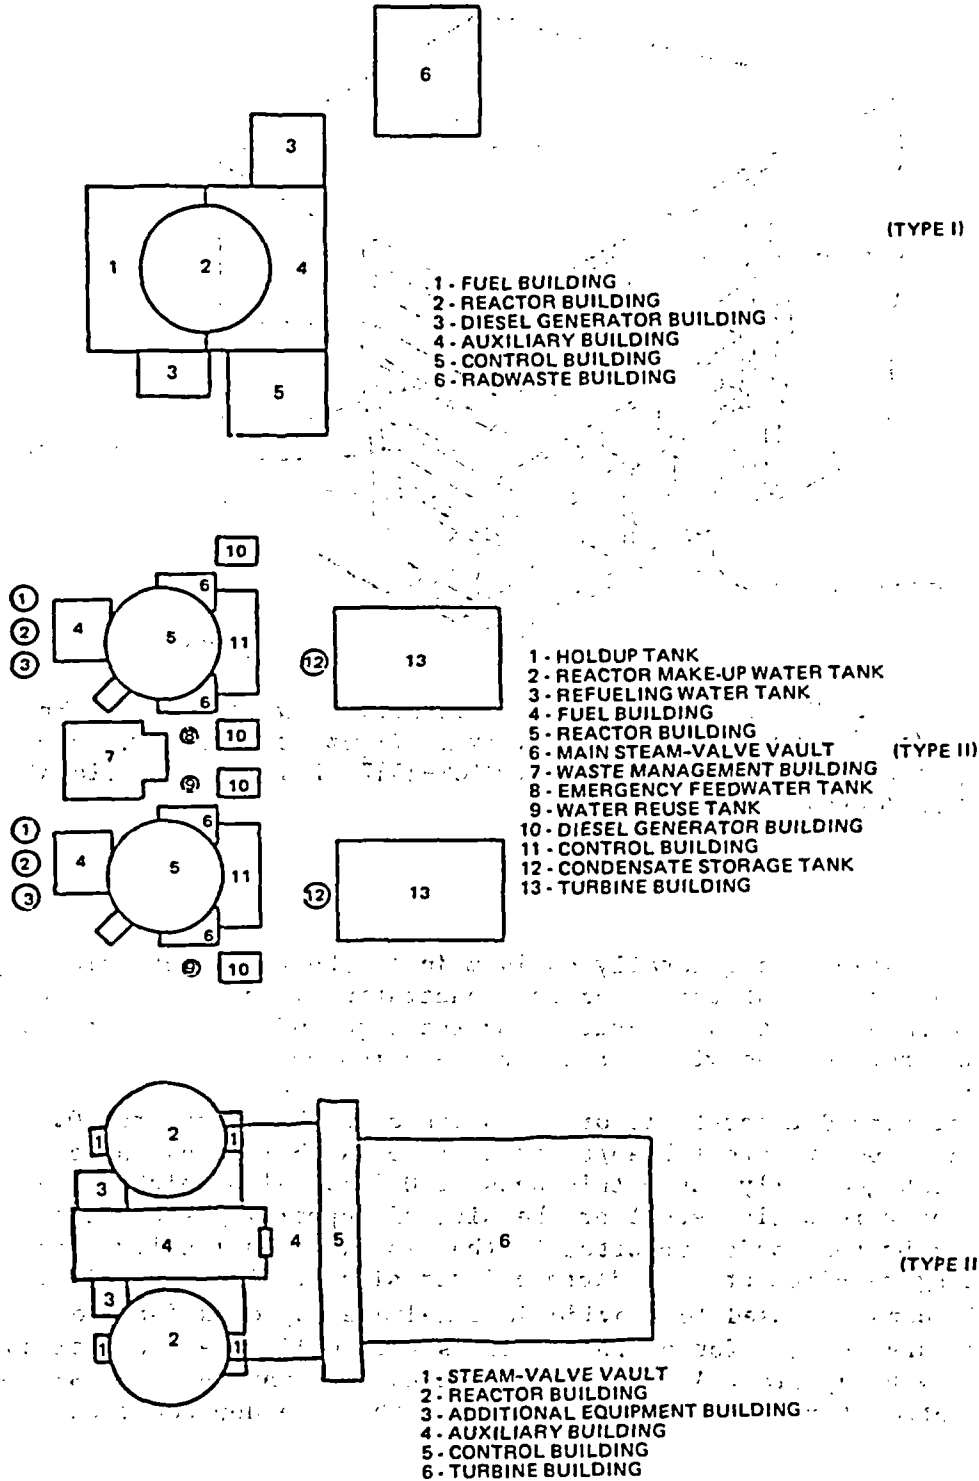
Generic nuclear power plant building layouts. Source: E. Endebrock et al., *Margins to Failure - Category I Structures Program: Background and Experimental Program Plan*, NUREG/CR-2347, Los Alamos National Laboratory, New Mexico, September 1981.
